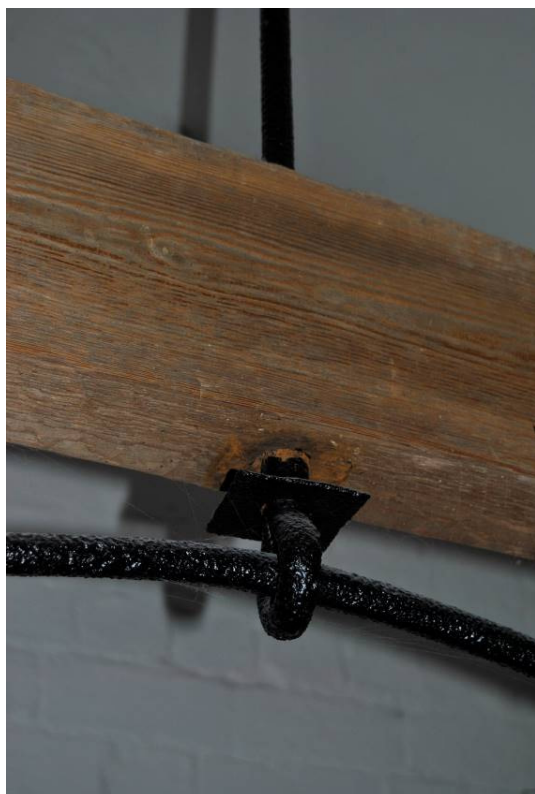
Detail of king-bolt / tension-rod at collar soffit.
